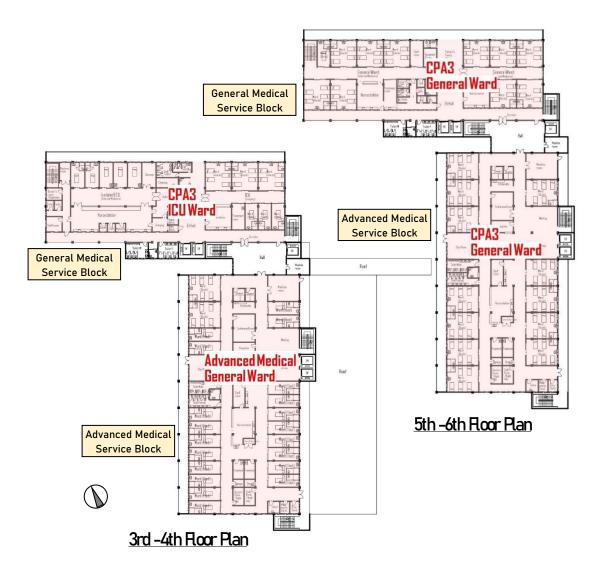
3rd-4th and 5th-6th Floor Plan of KCH
